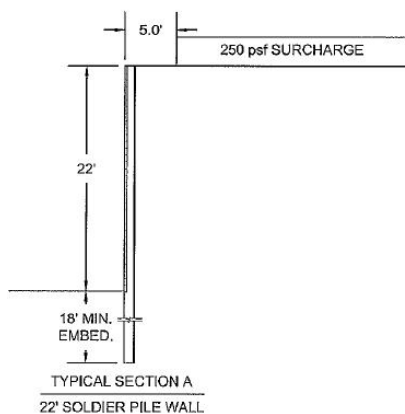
Soldier Pile System (Acceptable Load on wall)
